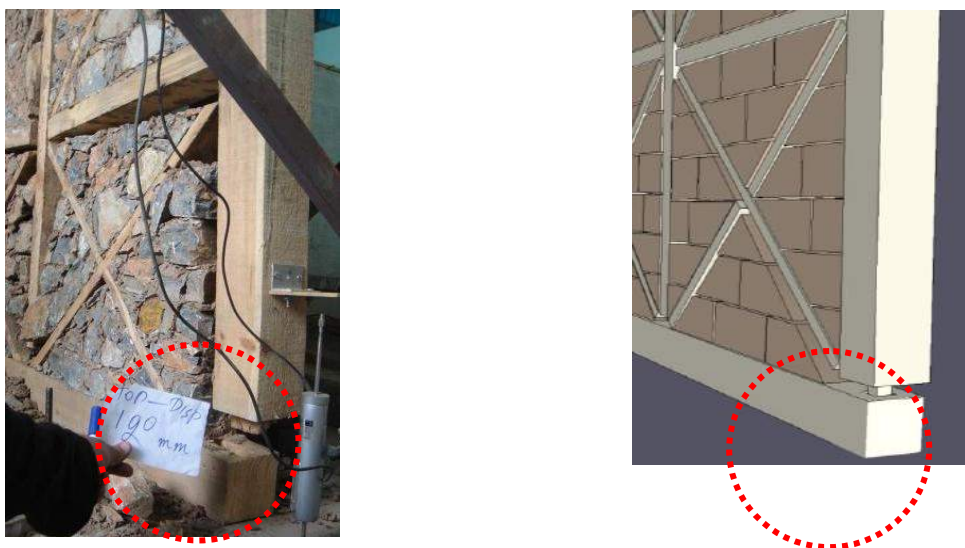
Potential source of weakness at the corners of the timber frame construction
